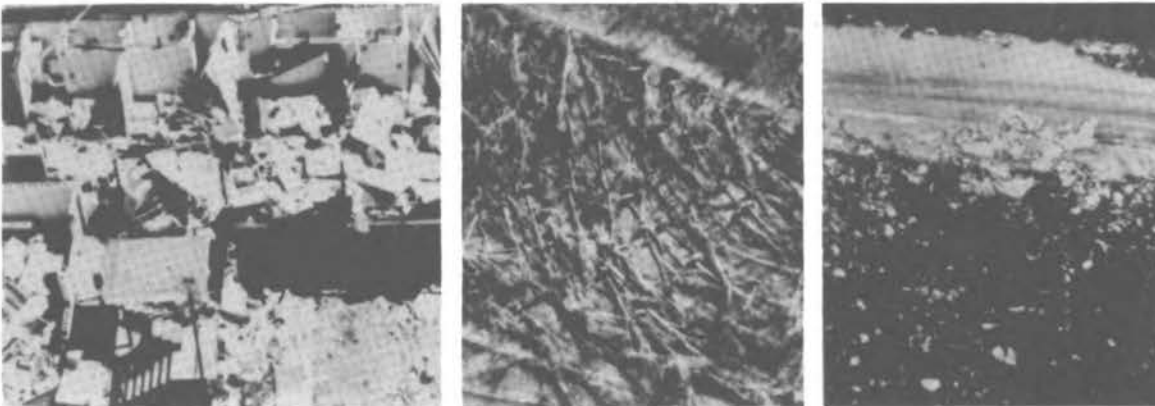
D Severe damage (F3) on the Fujita scale (winds of 158 to 206 mph). Roofs and some walls torn off well-constructed frame houses; some rural buildings completely demolished; steel-framed hangar- or warehouse-type structures blown down; trains overturned; heavy cars lifted off ground and thrown; most trees in a forest uprooted, snapped, or leveled; weak pavement blown off roads.
